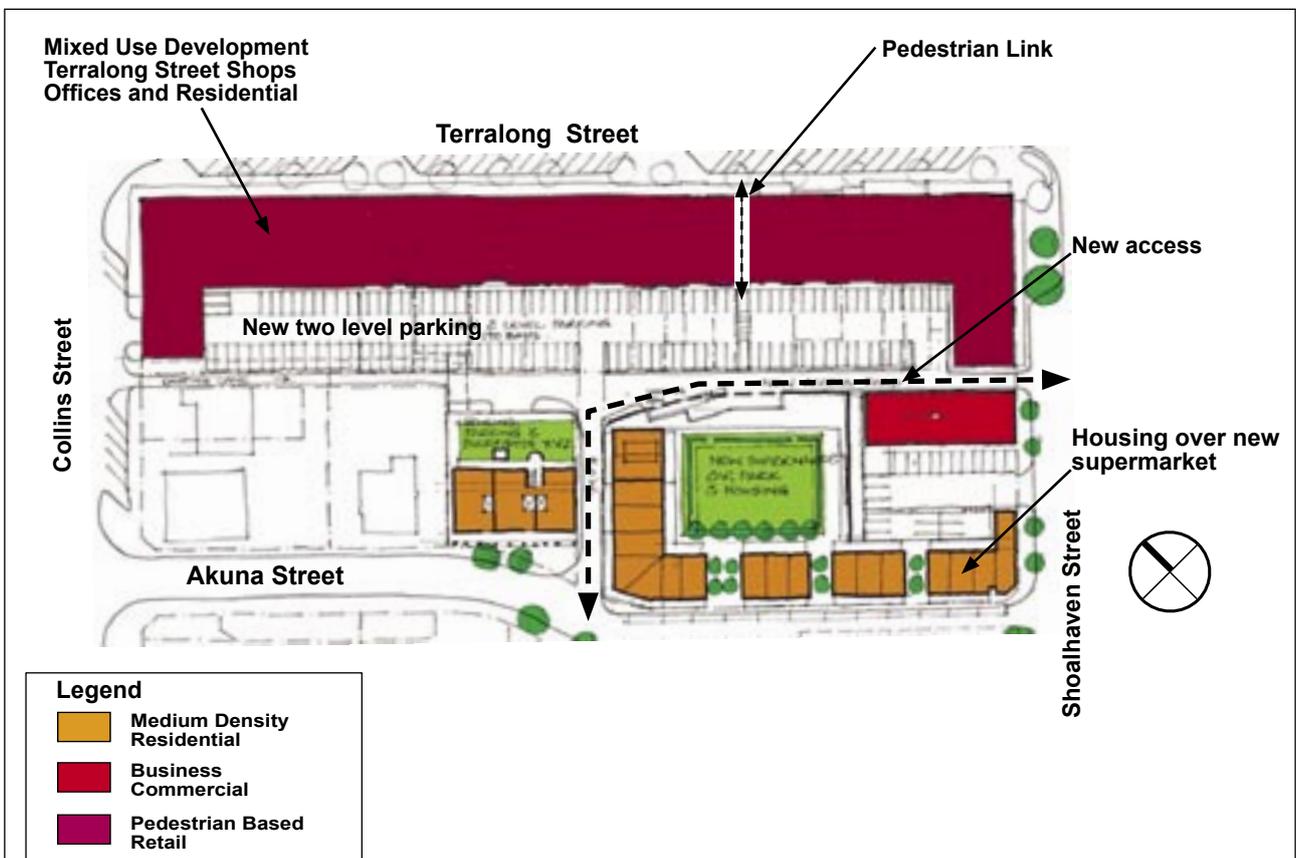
Plan of improved Shopping Strip with rear deck parking, accessed along rear lane
